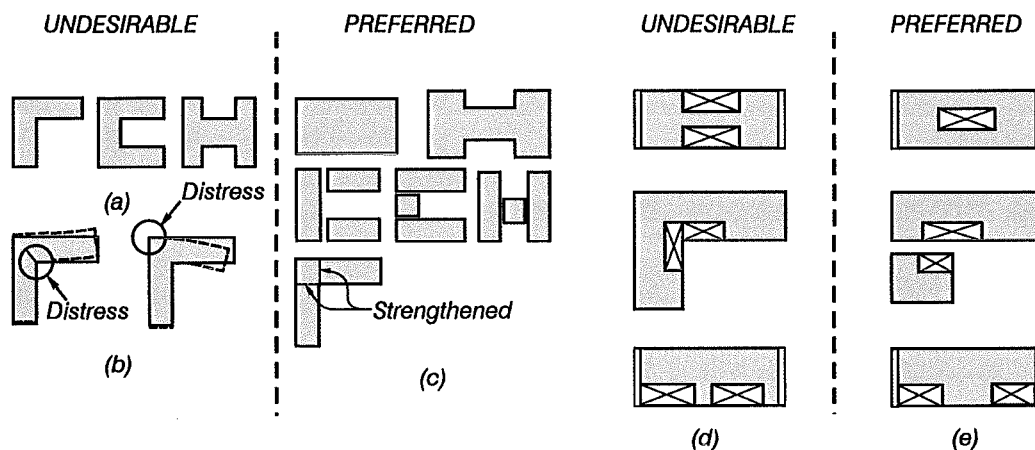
Desirable and undesirable configurations for building plans (Paulay and Priestley, 1992)
